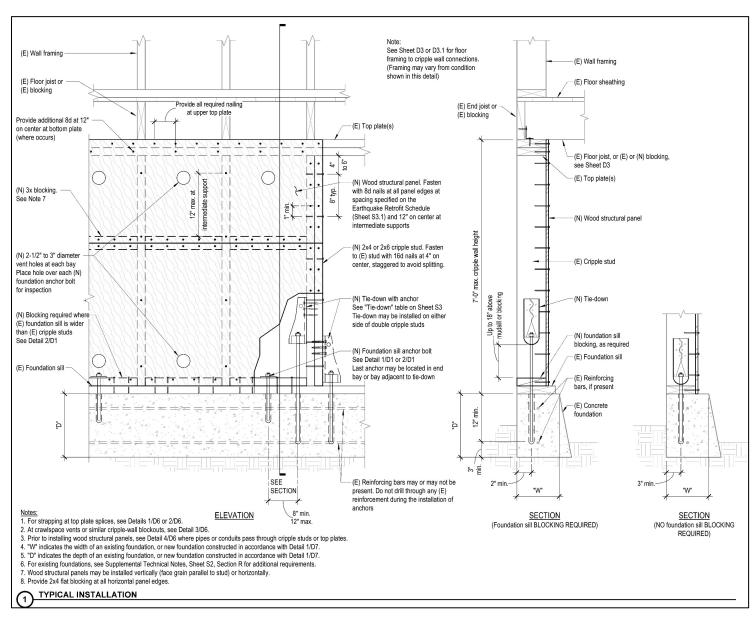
Wood structural panel installation with tie-downs. Sheet D5.
